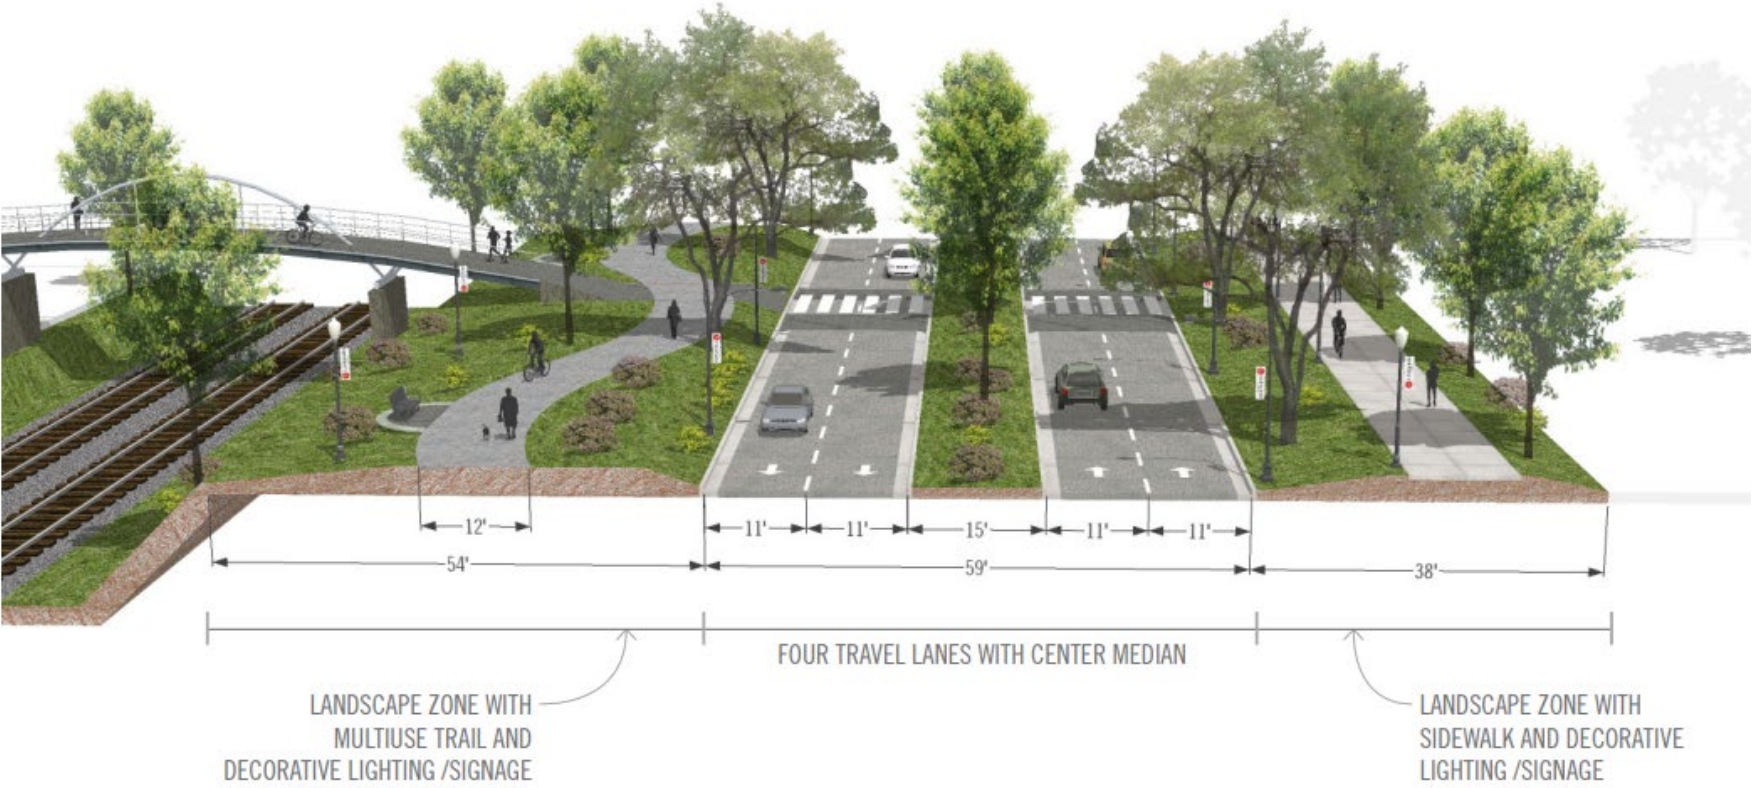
Recommendations for Lafayette Parkway from South David Road to Downtown
